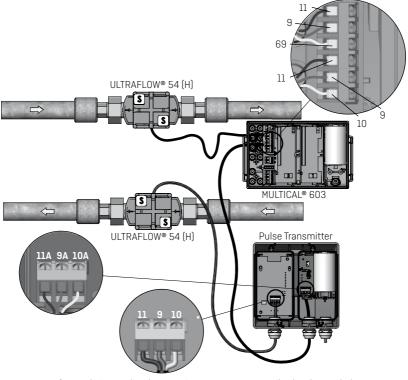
Forward and return pipes are not necessarily closely coupled. Electric welding * can occur.
